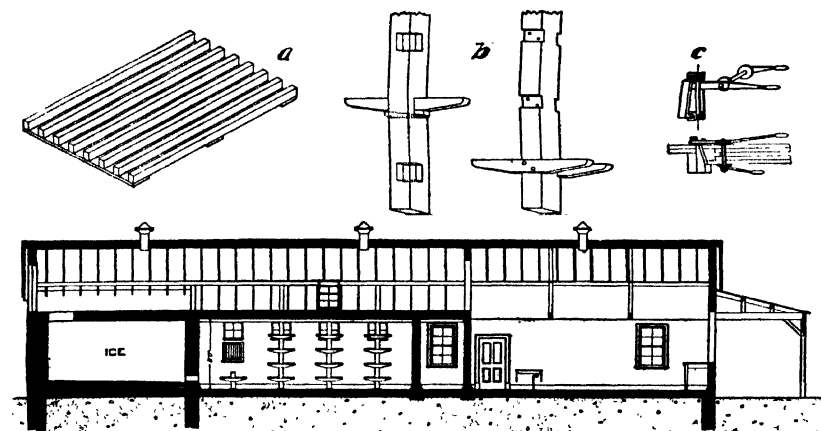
Longitudinal section of wood-construction cheese factory. *a*, Detail of racks; *b*, detail of posts and brackets; *c*, door fastening.
